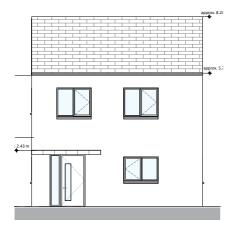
3-Bed Unit Front Elevation (not to scale)
